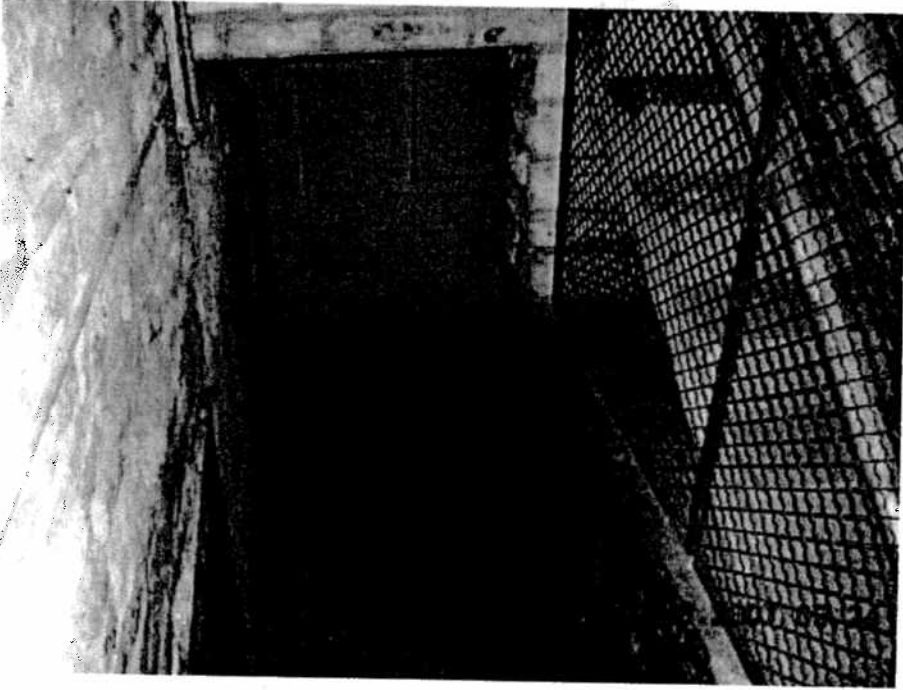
View from top of the stairwell into the basement IFR. The IFR entrance is located on the northeast side of the drill floor.
